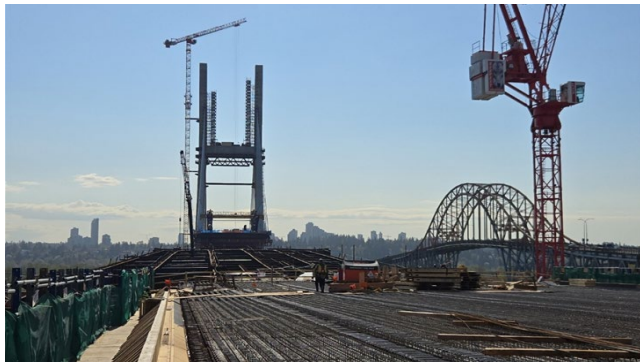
Precast deck panels have been installed on new bridge over Columbia Street.
